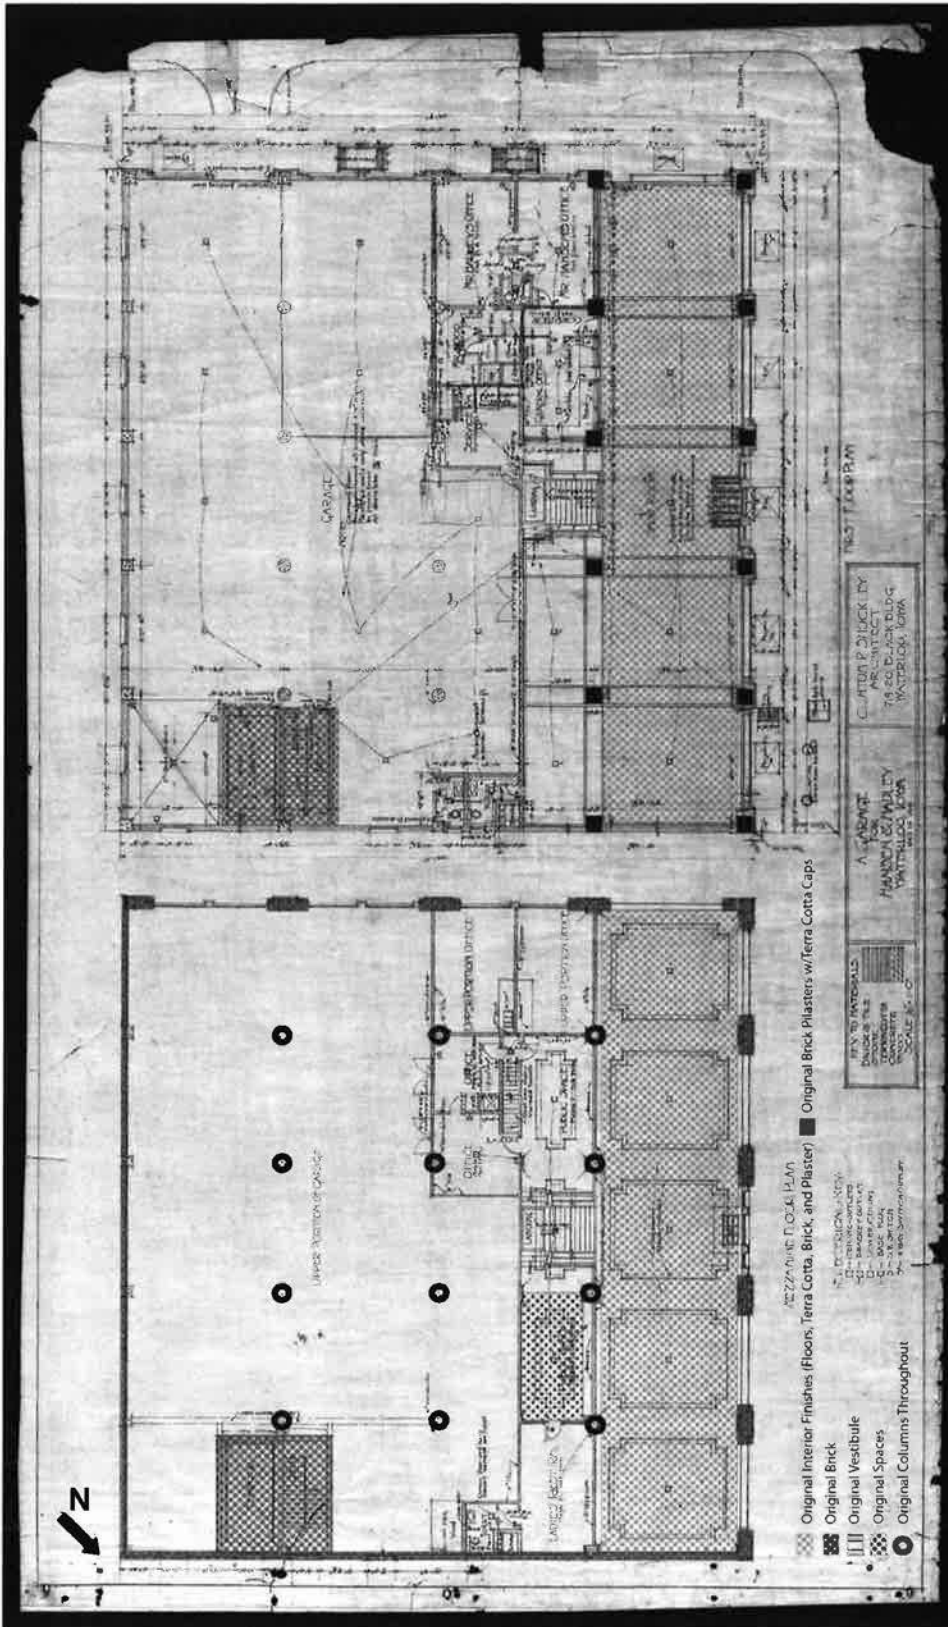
First Floor Plan Showing Location of Original Brick Walls and Interior Materials of Auto Showroom and Mezzanine (Clinton P. Shockley 1915)
